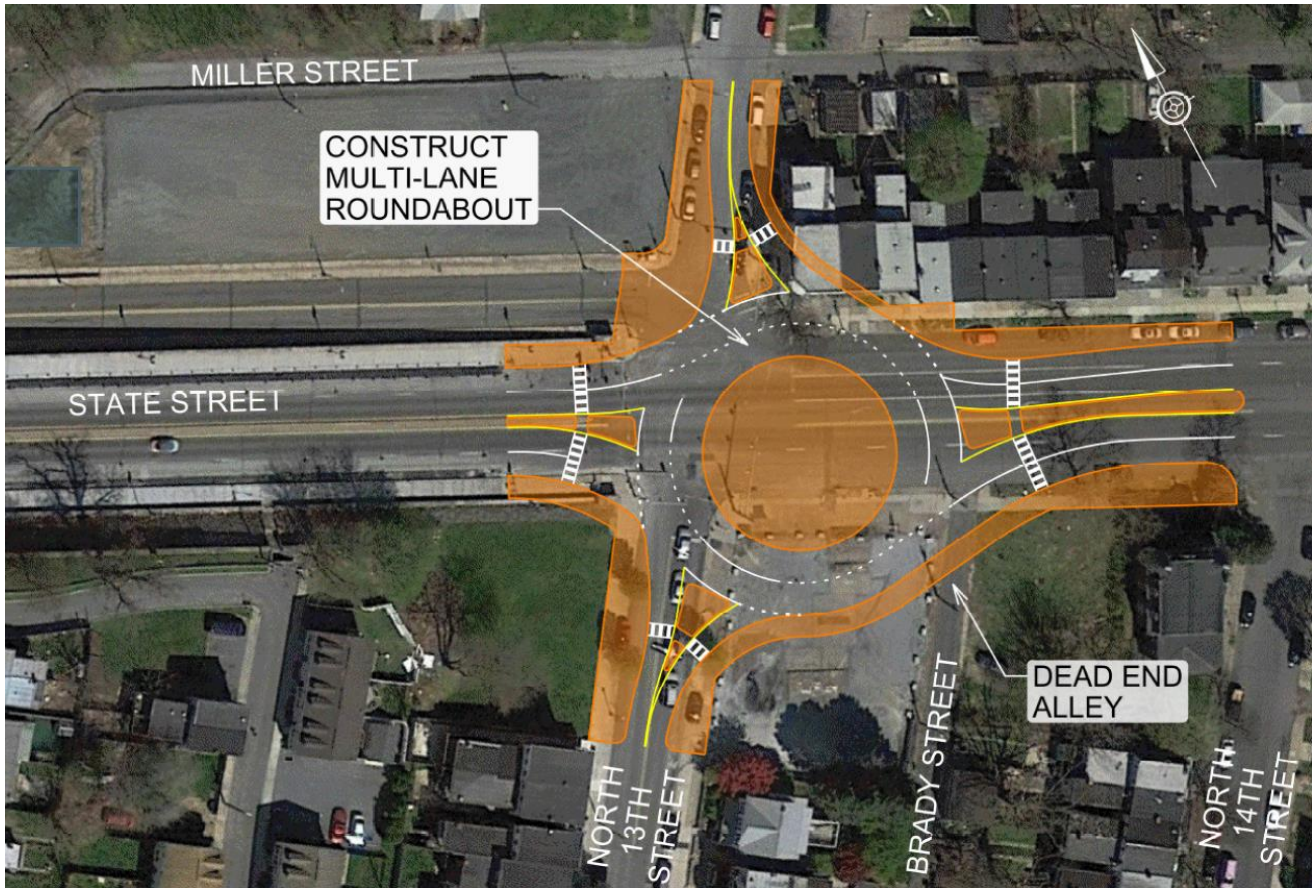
Proposed roundabout concept, State Street at 13th Street
